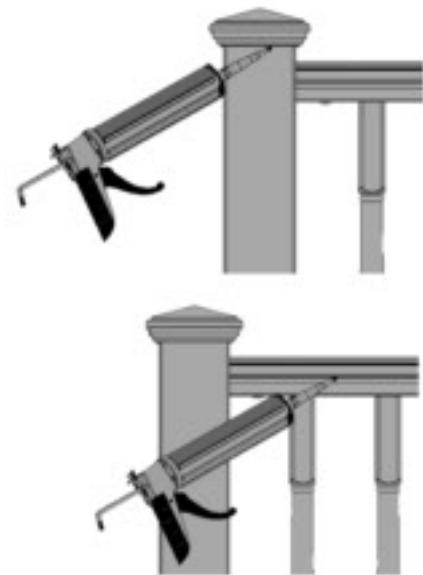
A & 24B: INSTALL NEWEL POST CAPS
